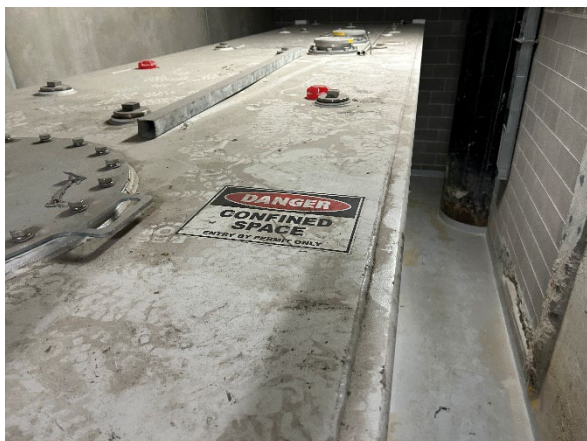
Ground Floor Loading Dock, Fuel Area, 19,000L Diesel Tank – confined space.
